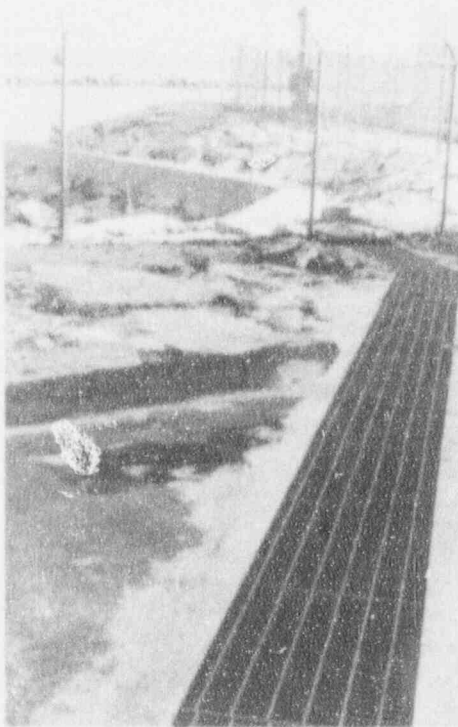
The 300 foot long Pilgrim Station, concrete screenwash sluiceway is molded from 18" corrugated metal pipe, and meanders over breakwater rip rap.
